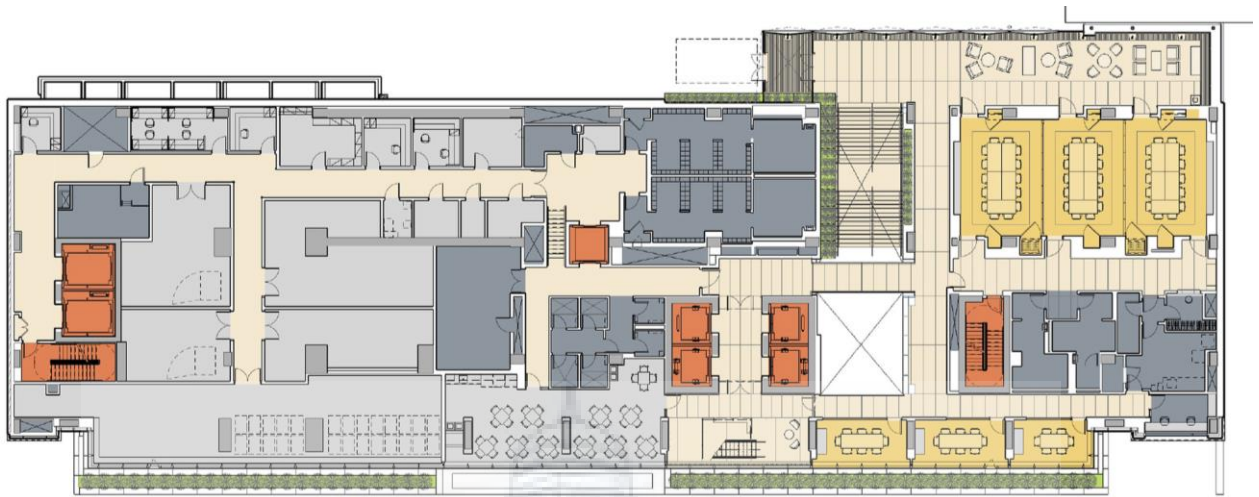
Section Weill Cornell Medical College Belfer Research Building
